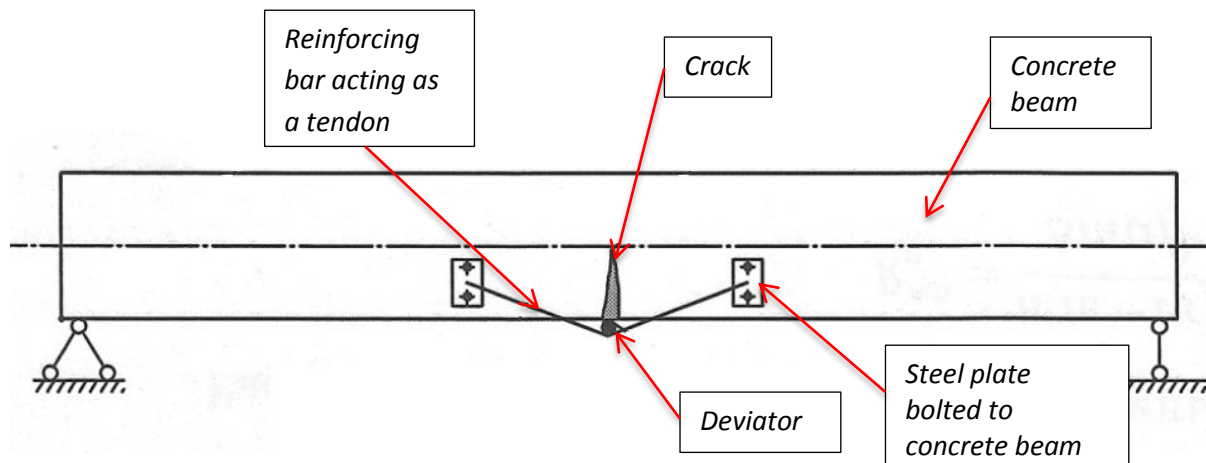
Strengthening cracked concrete beams using local post-tensioning (Shagin, 2008).
